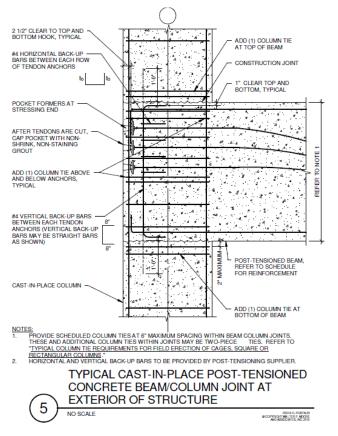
| Typical Cast-In-Place PT Exterior Beam/Column Joint in Parking Garage (Courtesy of WPM)
